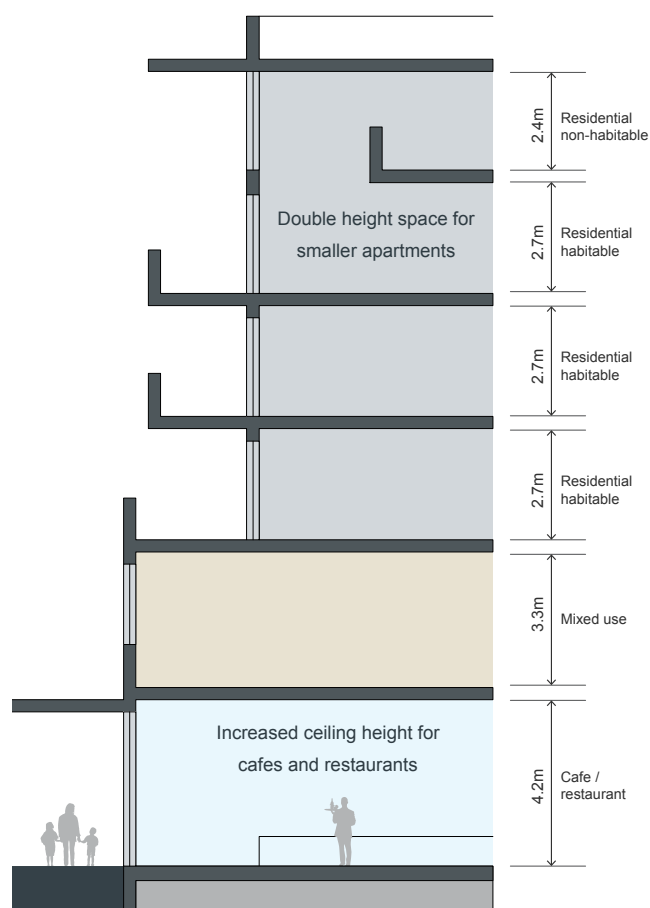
Retail and commercial floors of mixed use buildings require greater ceiling heights
